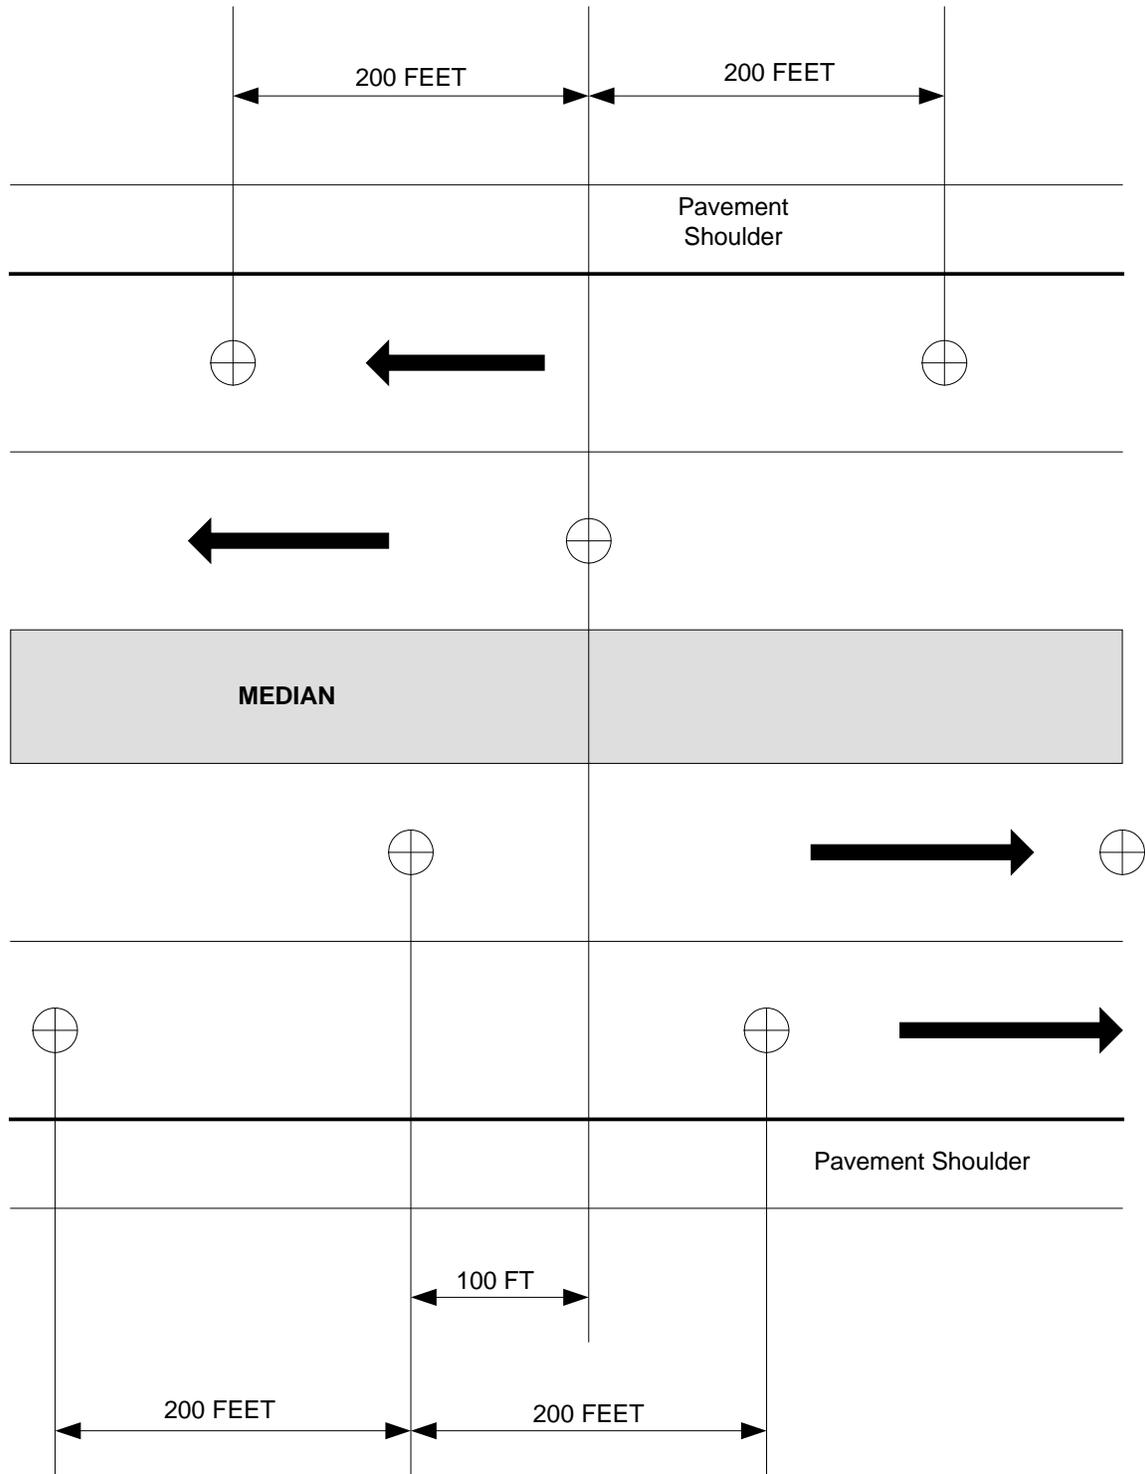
EXPLORATION LAYOUT FOR A FOUR (4) LANE DIVIDED ROAD
